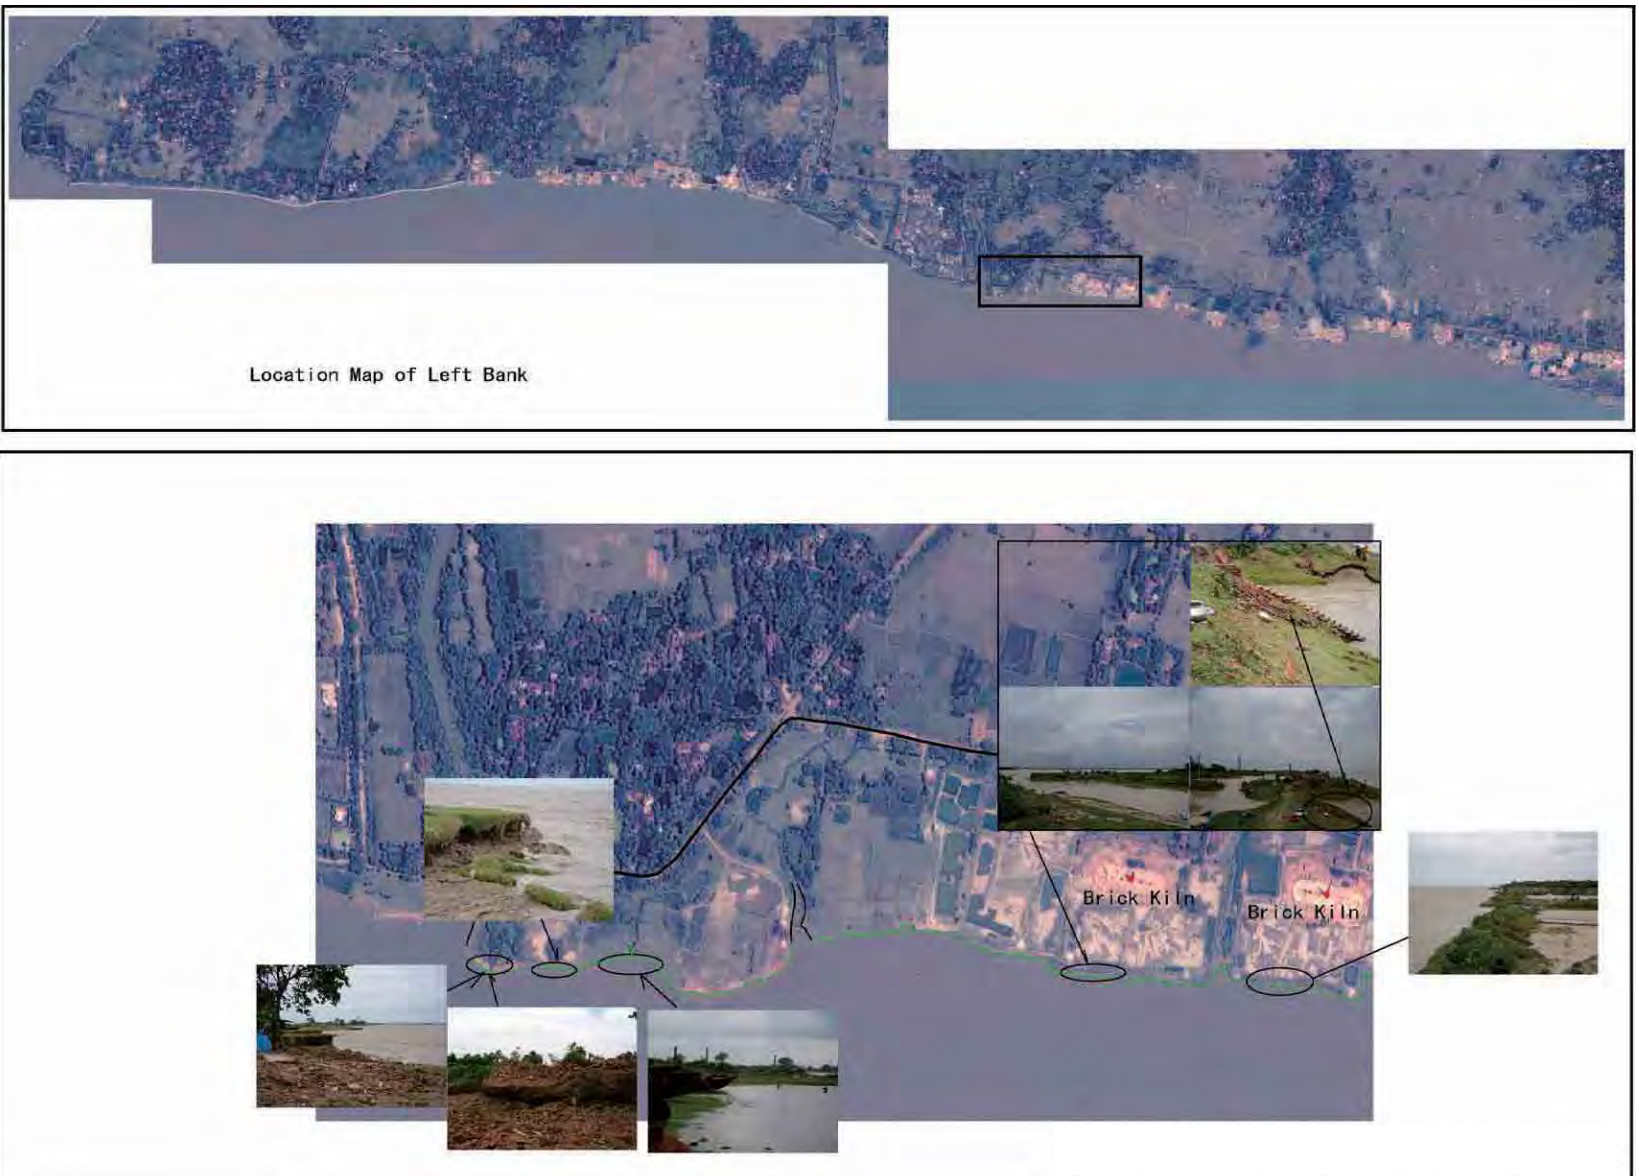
River Bank Protection Works at Left Bank (5/6)
